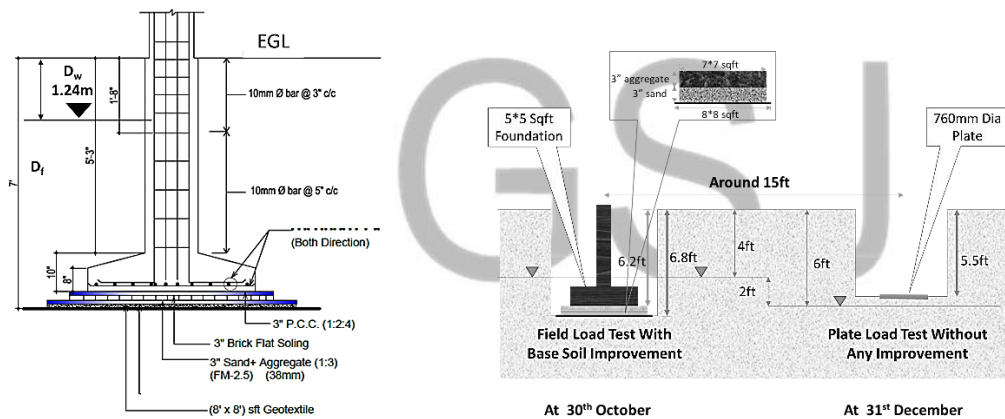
Cross Section of the foundation, experimental setup with and without improvement
